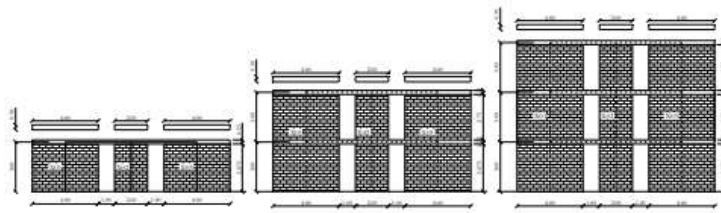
Some of the structural configurations analyzed: 1, 2 and 3 storey plane masonry walls
